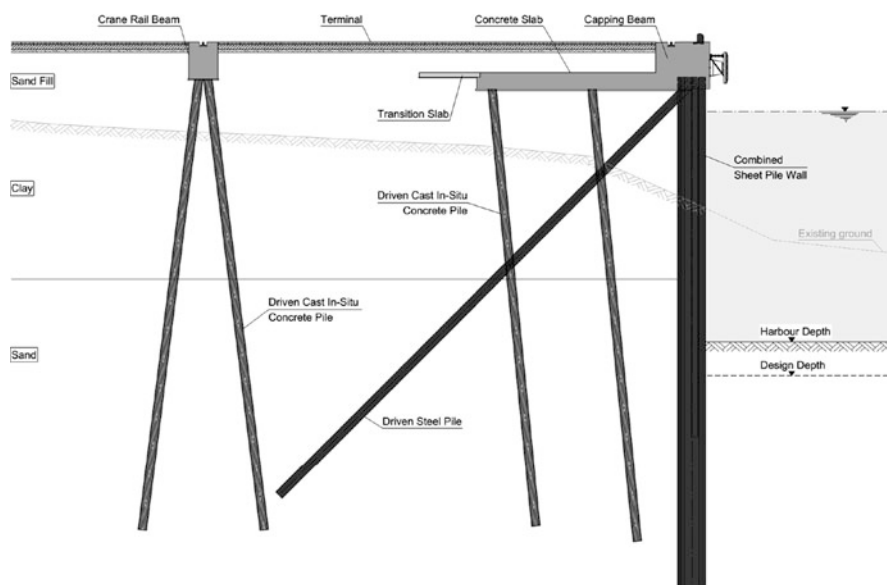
Anchored sheet pile wall with shielding slab (cross section)
